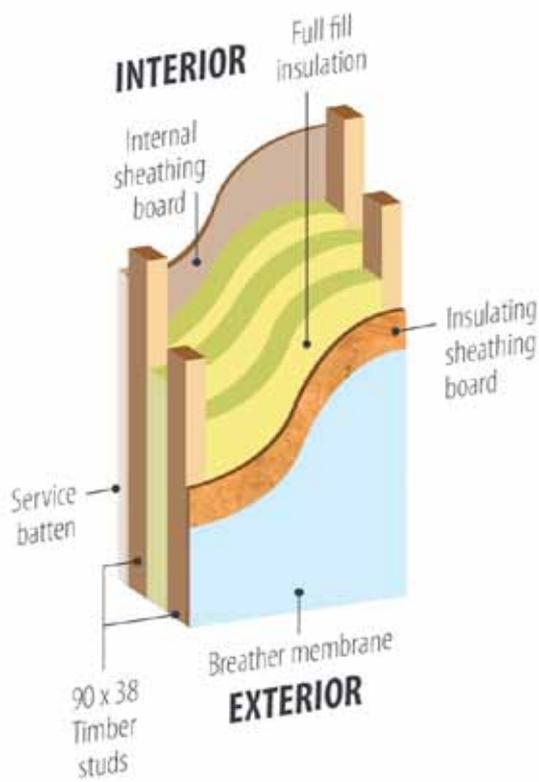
Typical twin-wall layout in the ‘Wise Wall T’ system by Framewise (image: courtesy of Framewise)
